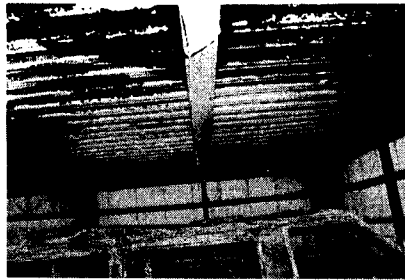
The View of Beam and Deck Plate After Fire Fighting
